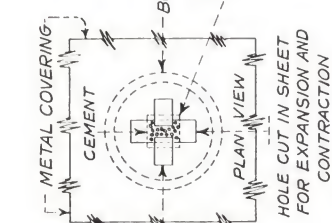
FASTENING SHEET METAL COVERING WITH CAULKED BOLT, NUT AND WASHER
